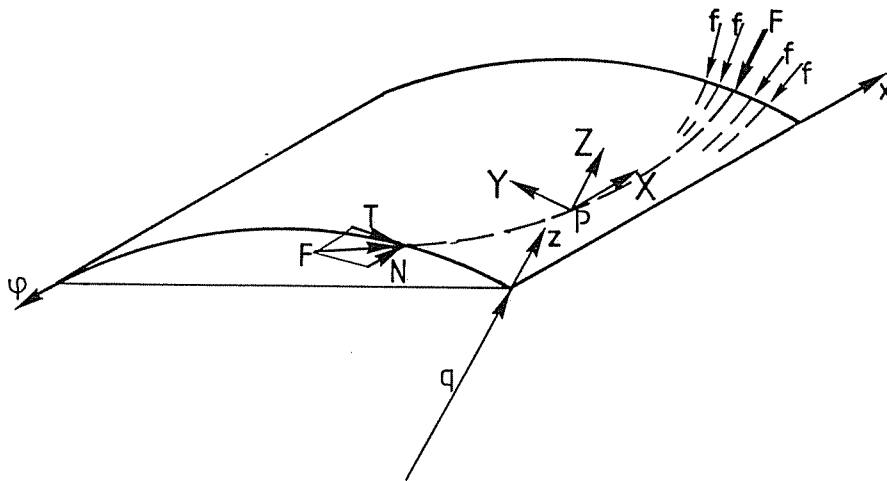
Concrete shell roof with curved prestressed cables..
